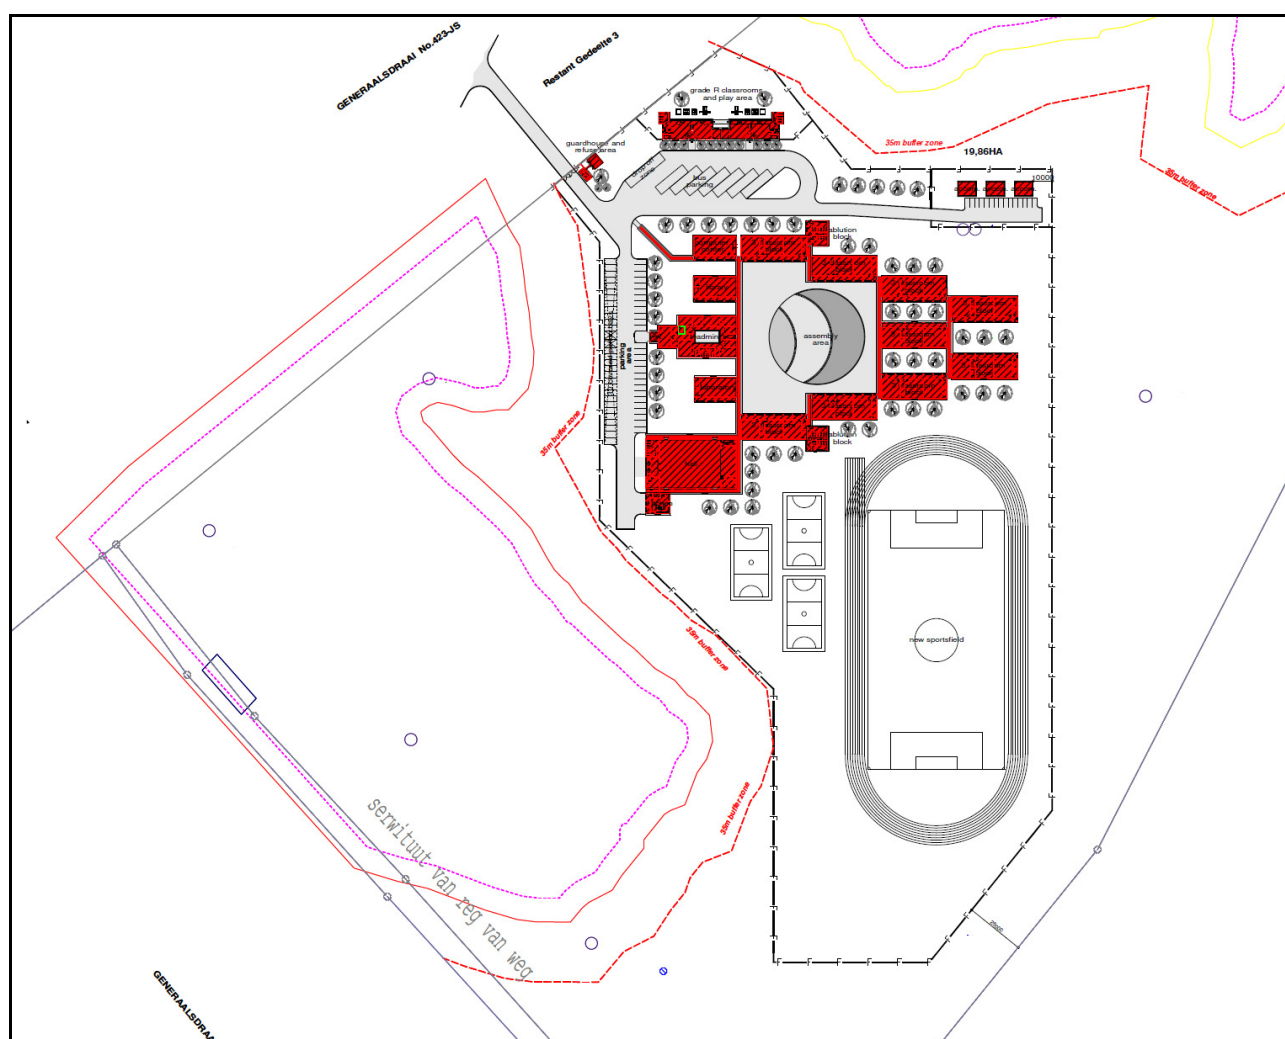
Layout Plan No. 4 (preferred layout plan) (taken from Bakopane Architects, 2017)
